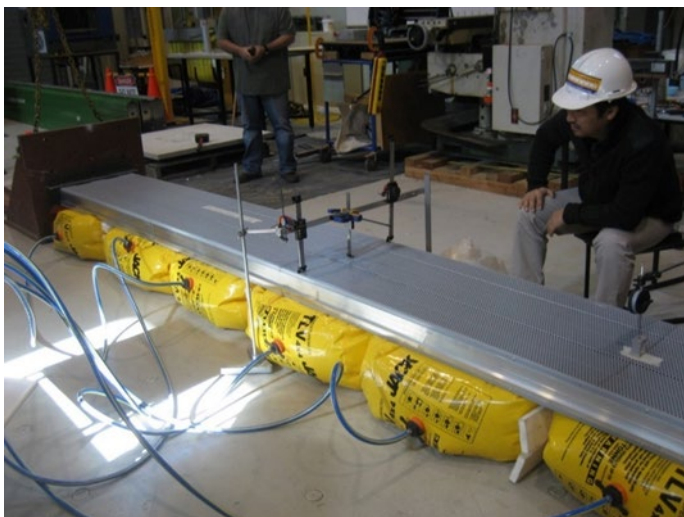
(a) – Typical arrangement – Rigid unit material
